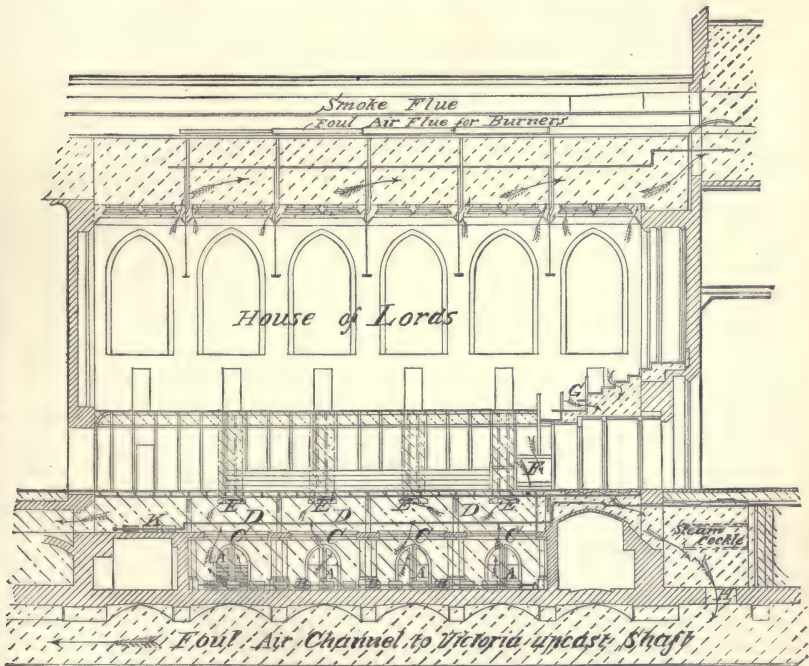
SECTIONAL ELEVATION OF THE HOUSE OF LORDS SHOWING WARMING AND VENTILATING ARRANGEMENTS.
